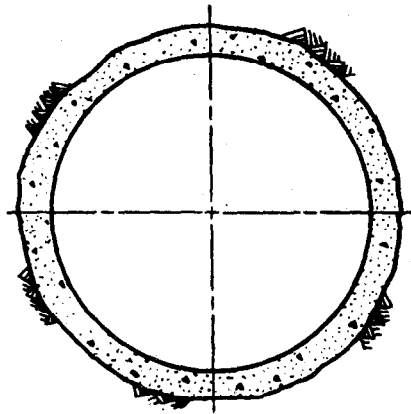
TYPICAL SECTION OF CONCRETE-LINED TUNNELS SHOWING A- AND B-LINES
